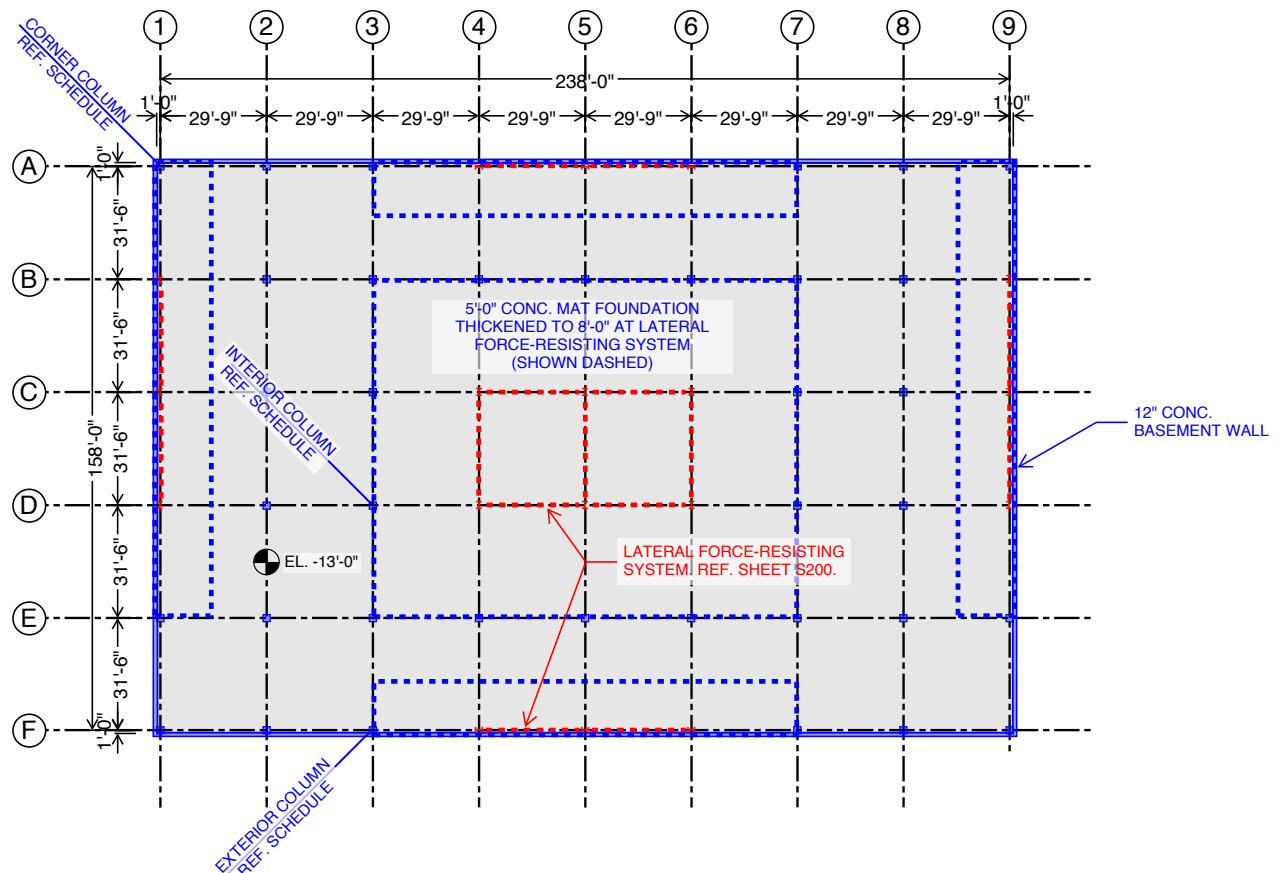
Basement level and foundation plan for the large structural steel office building
